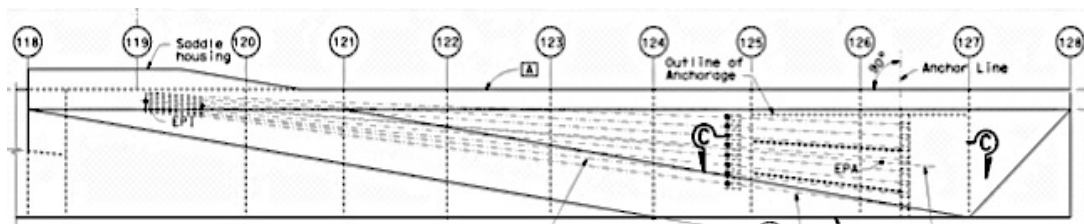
Side view of the east deck cable anchorage (Ref.: Caltrans drawings 731/1204).
